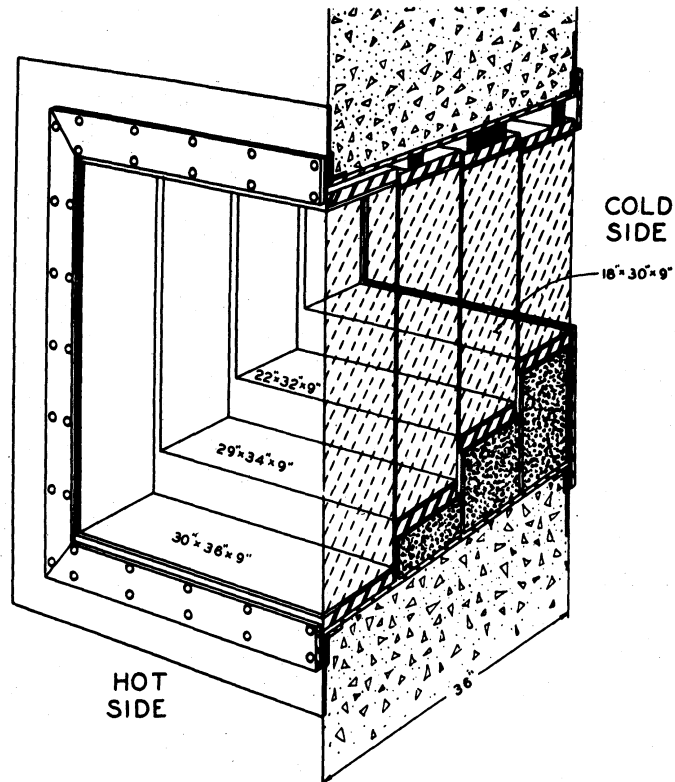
Isometric sketch showing construction details of a lead-glass shield window (8)
